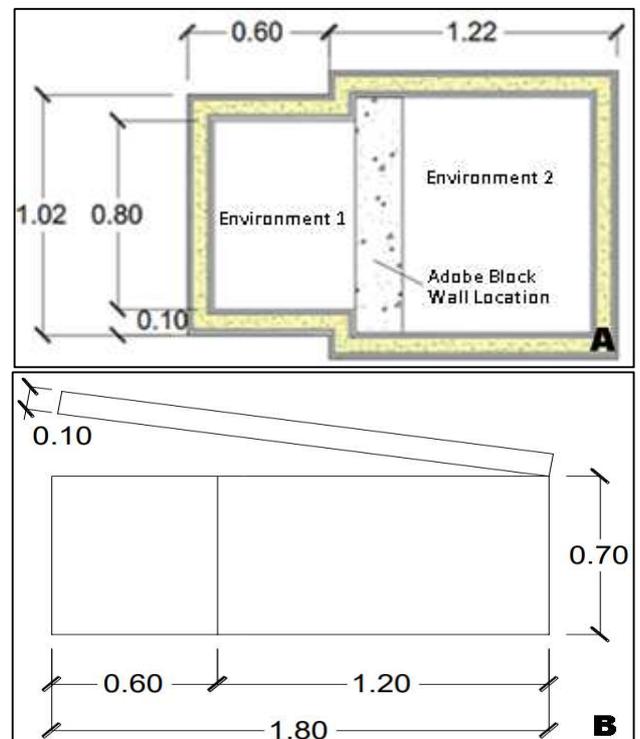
Dimensions of the test chamber (A) Landscape view and (B) Side View
